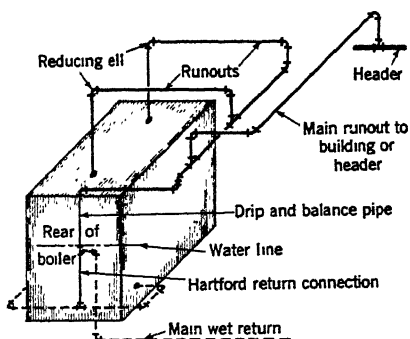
APPROVED METHOD OF BOILER CONNECTIONS
